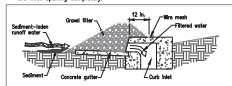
C. Cross-section detail of a gravel curb inlet protection.
